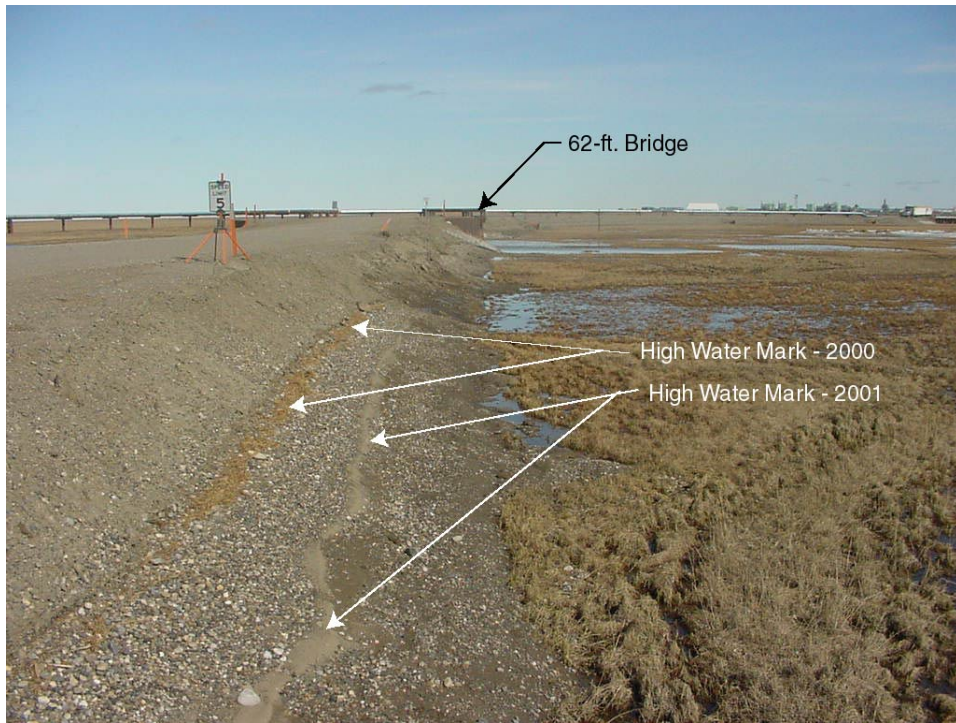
Facing east from Culvert #04 along the south side of the CD-2 access road. (6/15/01)
